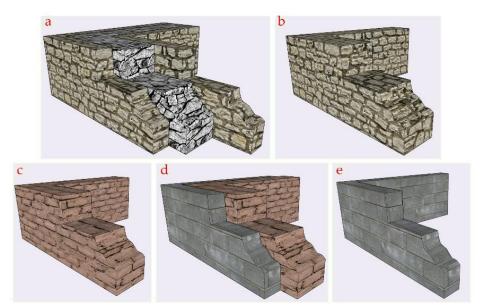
Observed wall and material types a)double-layered stone b)stone c)adobe d)briquette+adobe e)briquette
